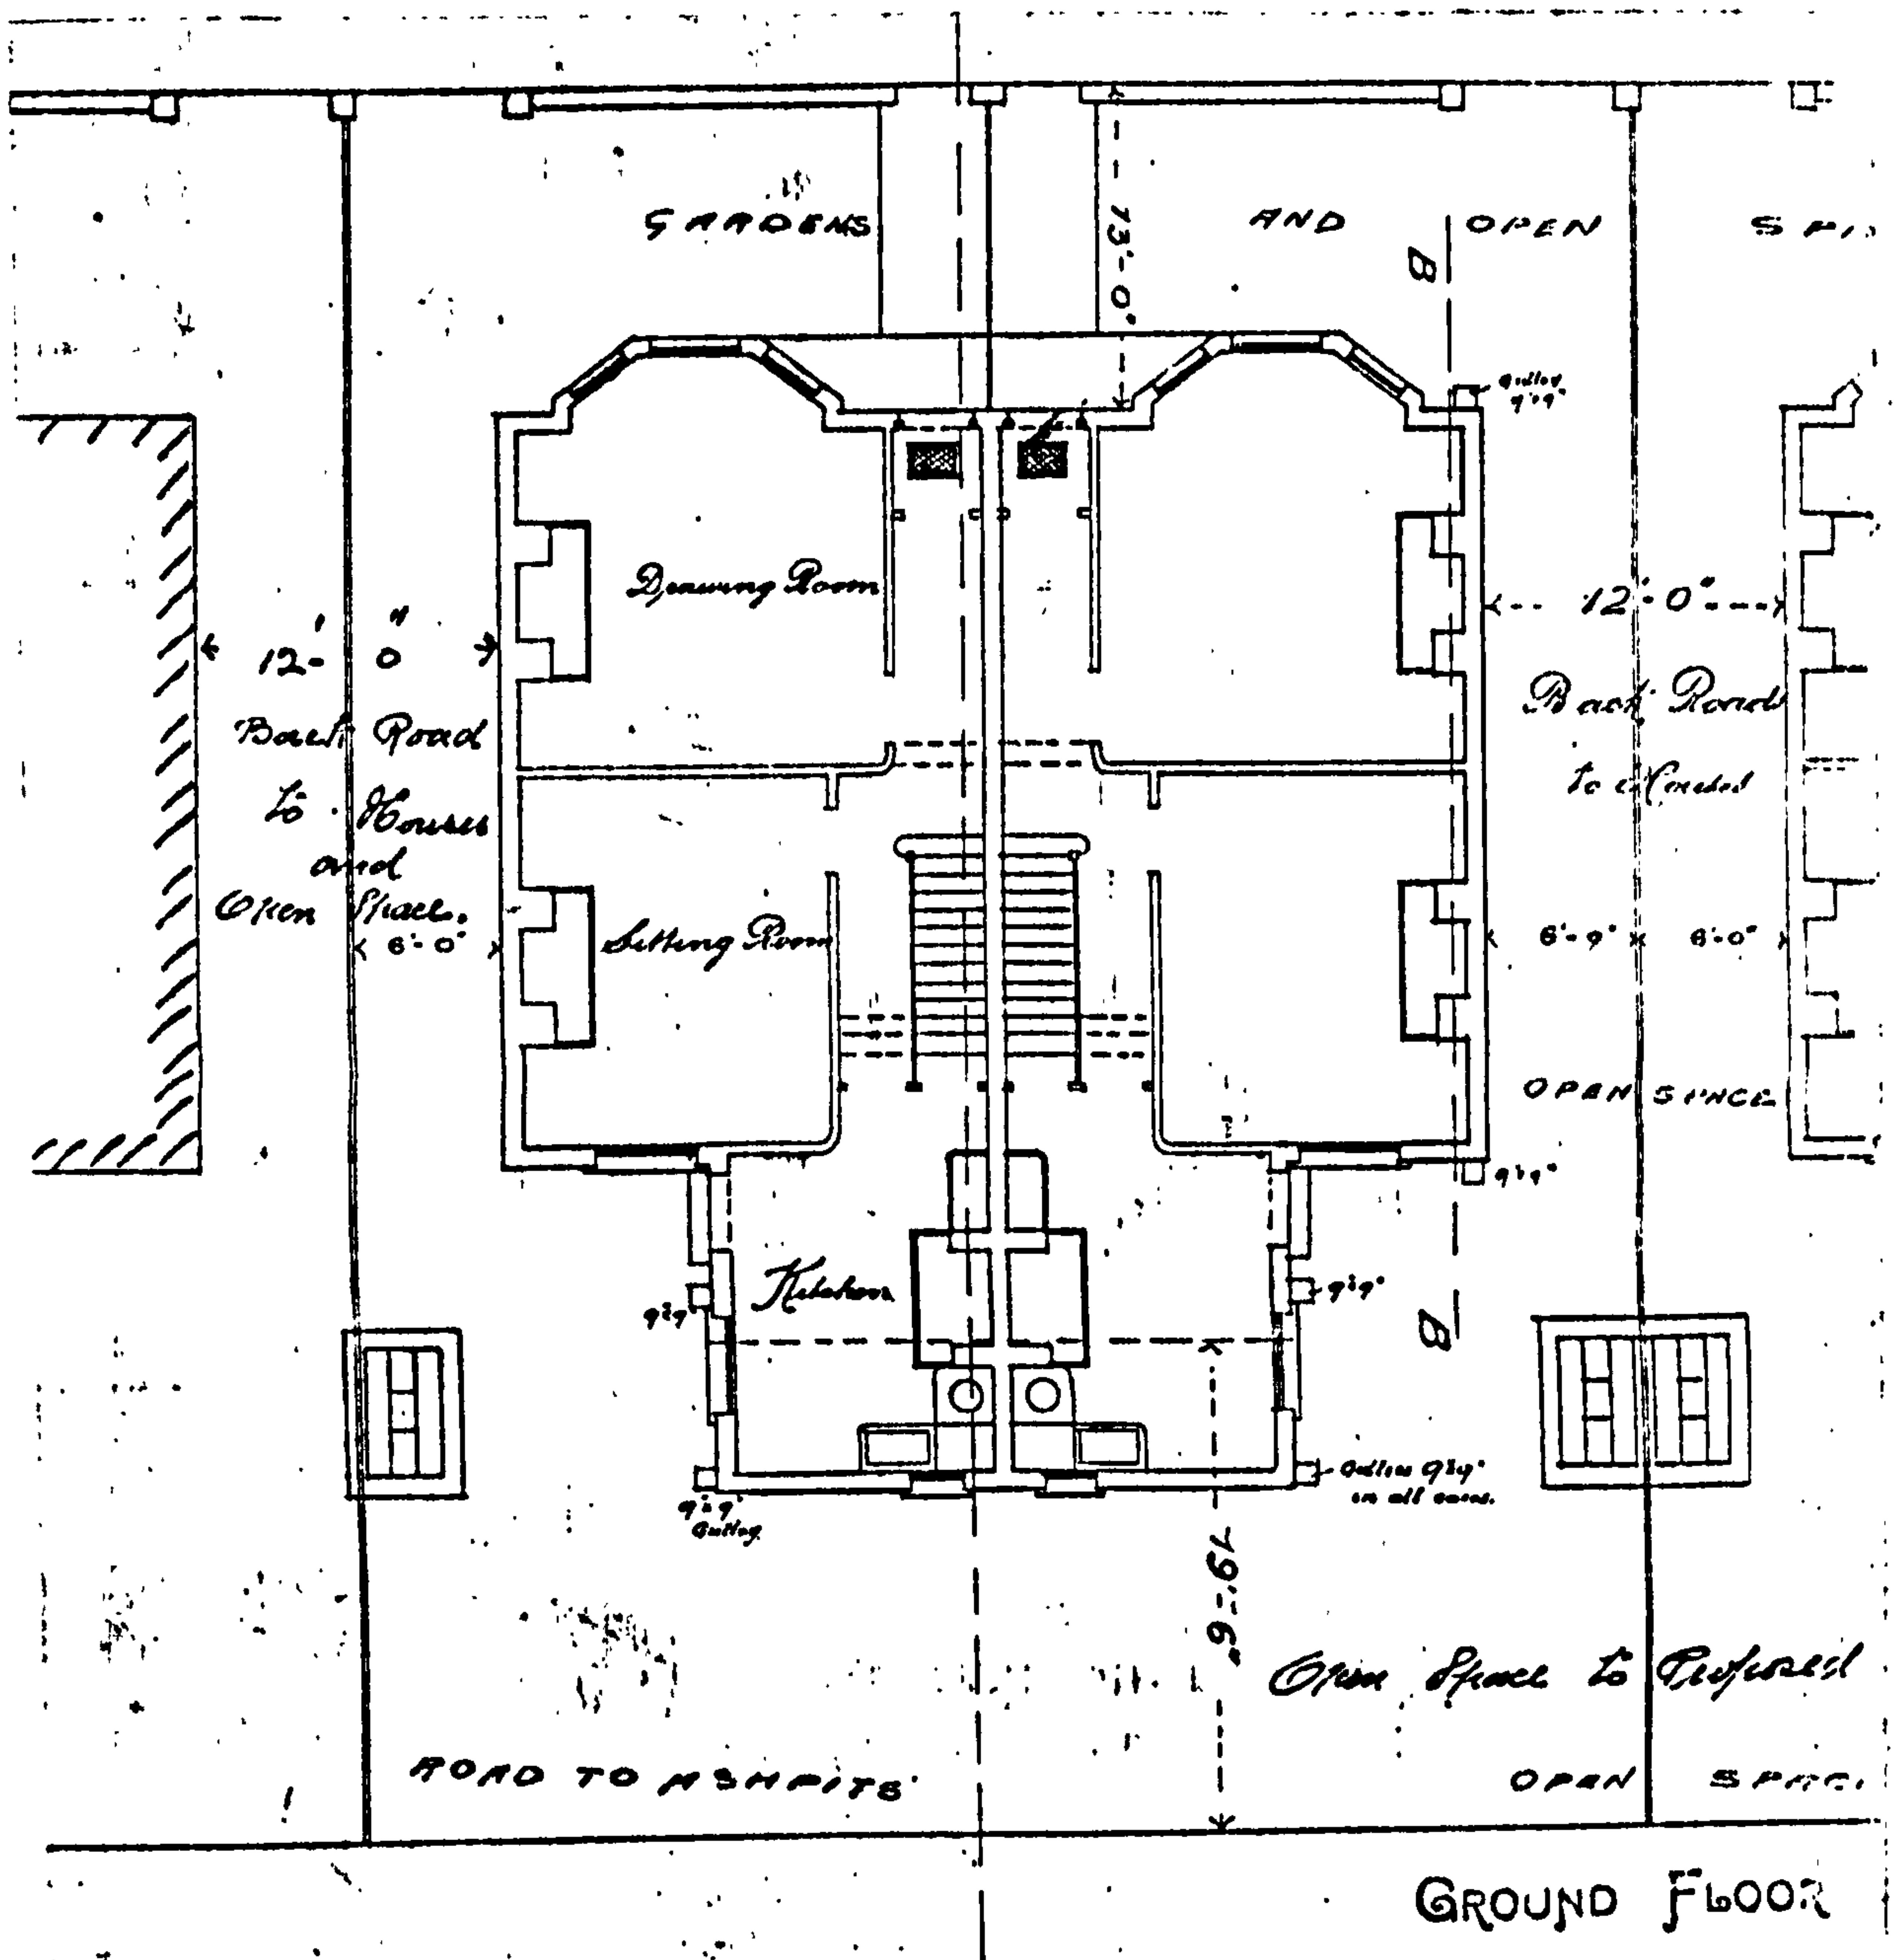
Deposited ground floor plan of two semi-detached houses, St. Michael's Terrace (C.F. Wilkinson 1896).
